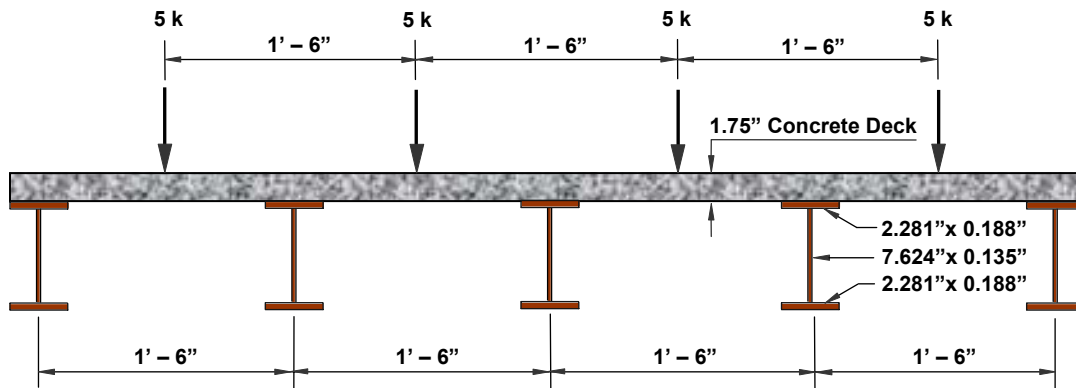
Newmark bridge cross-section with horizontal loading positions
